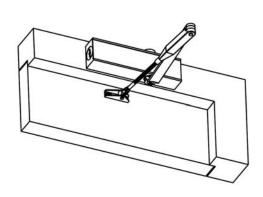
(Fig 66) (Fig 6) Parallel Arm Application
